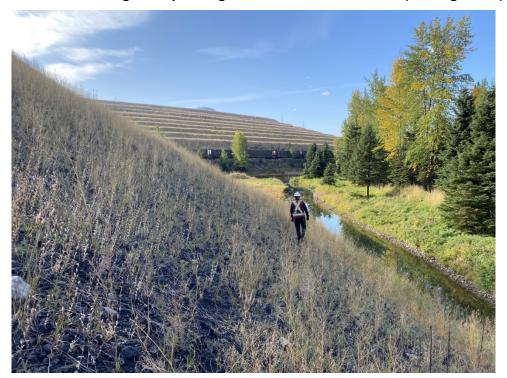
Lagoon C toe adjacent to the Elkview rail line. (looking south)
